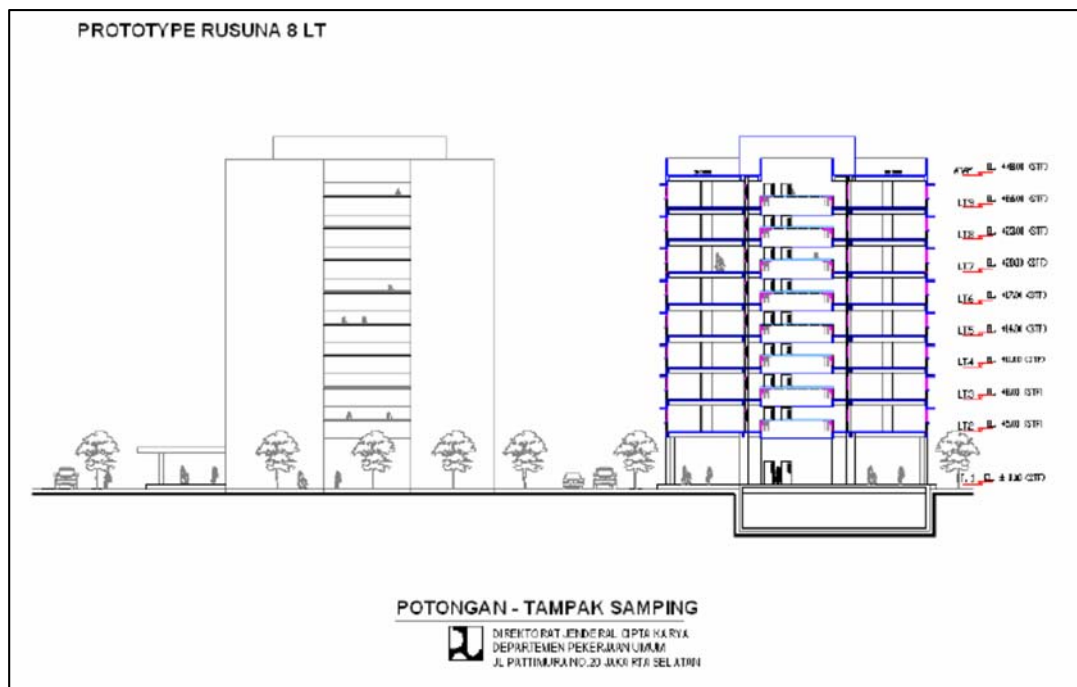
Symmetric Parallel Model Plan Elevation and Side View
